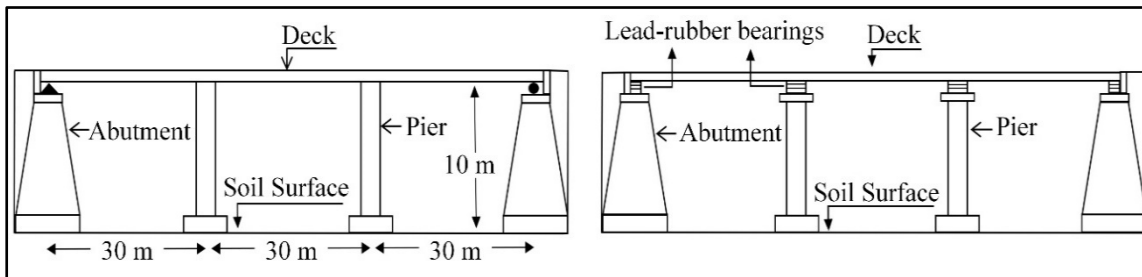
General elevation of the studied conventional (left) and isolated (right) bridge
